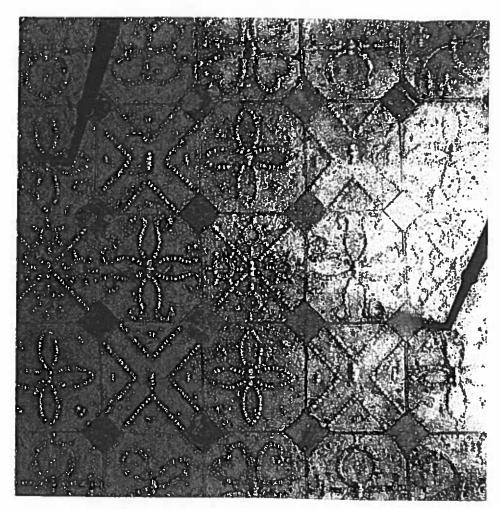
Detail of bone- patterned floor at Cilwendeg Shell House. Photograph by Roger Clive- Powell, architect (2000)
